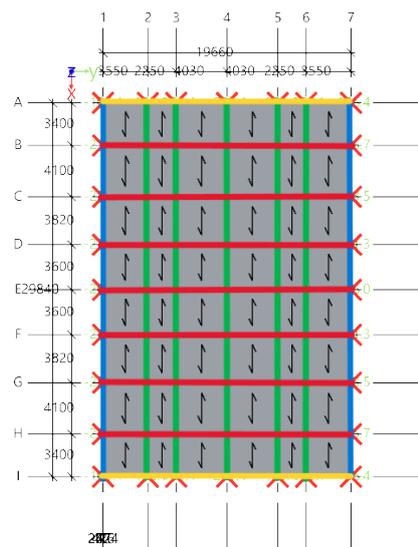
Primary internal beams (red), primary façade beams (yellow), secondary internal beams (green) and secondary façade beams (blue)
